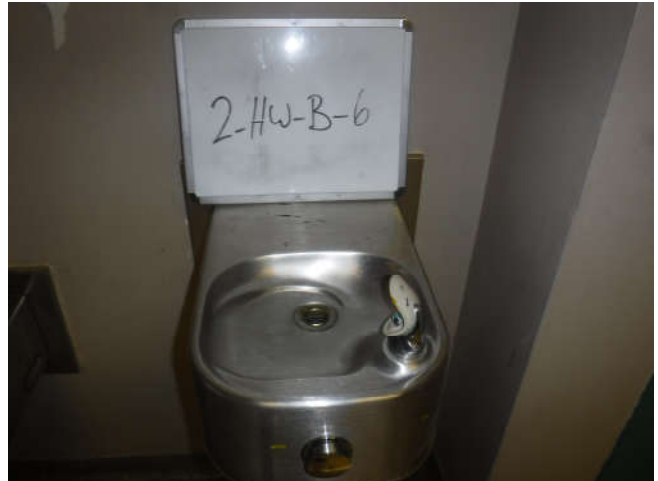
Bubbler, located in 2nd floor next room 213 (left)
